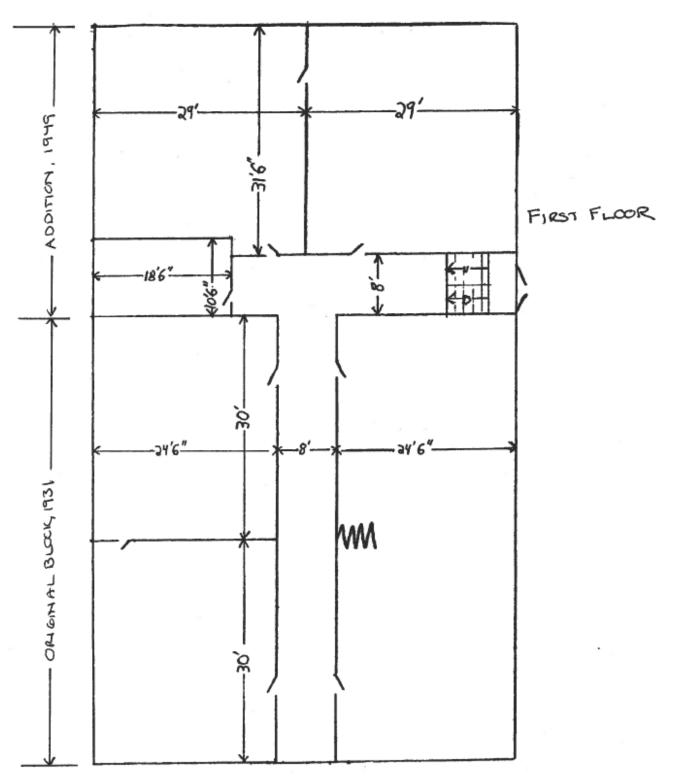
Floor Plan - 12 Schoolhouse Lane: First Floor
